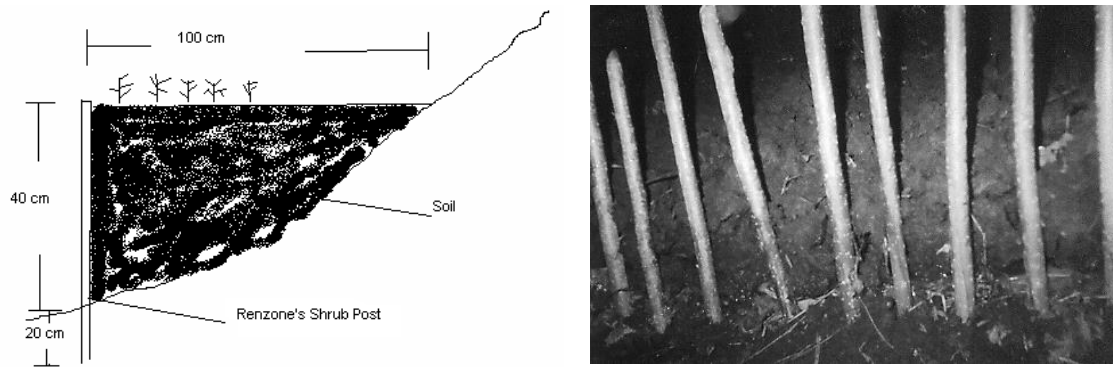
The constructed contour facility with Renzone's shrubs as post.
